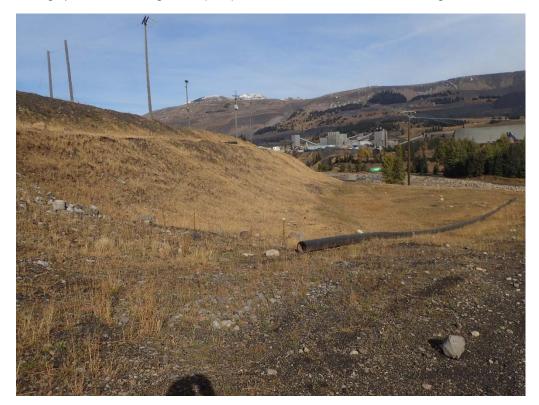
North Tailings Pond (NTP) overview from south abutment, looking north. 4 October 2017.
